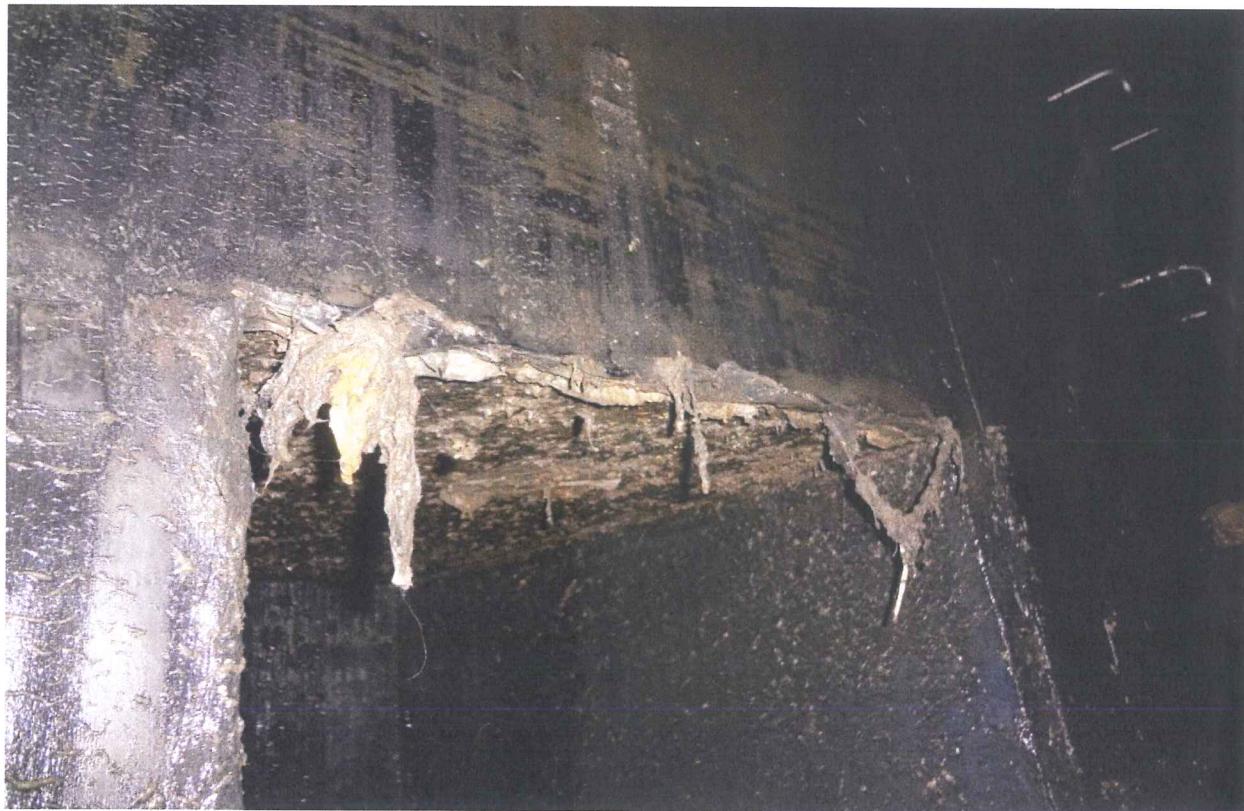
T-LOCK DAMAGED AROUND GATE OPENING
